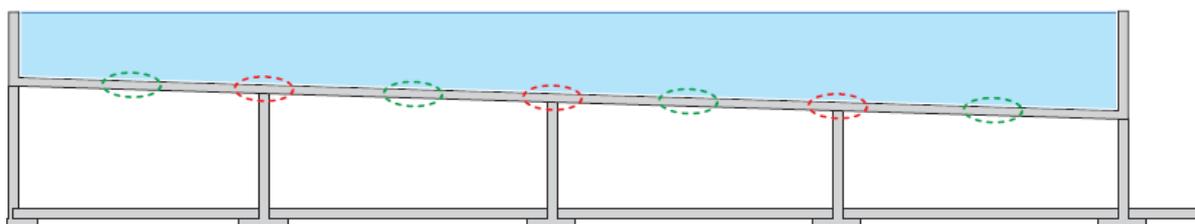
The concrete structure must be planned so that there is less shear strength between the tile and concrete than what the adhesive and membrane layer can endure.
